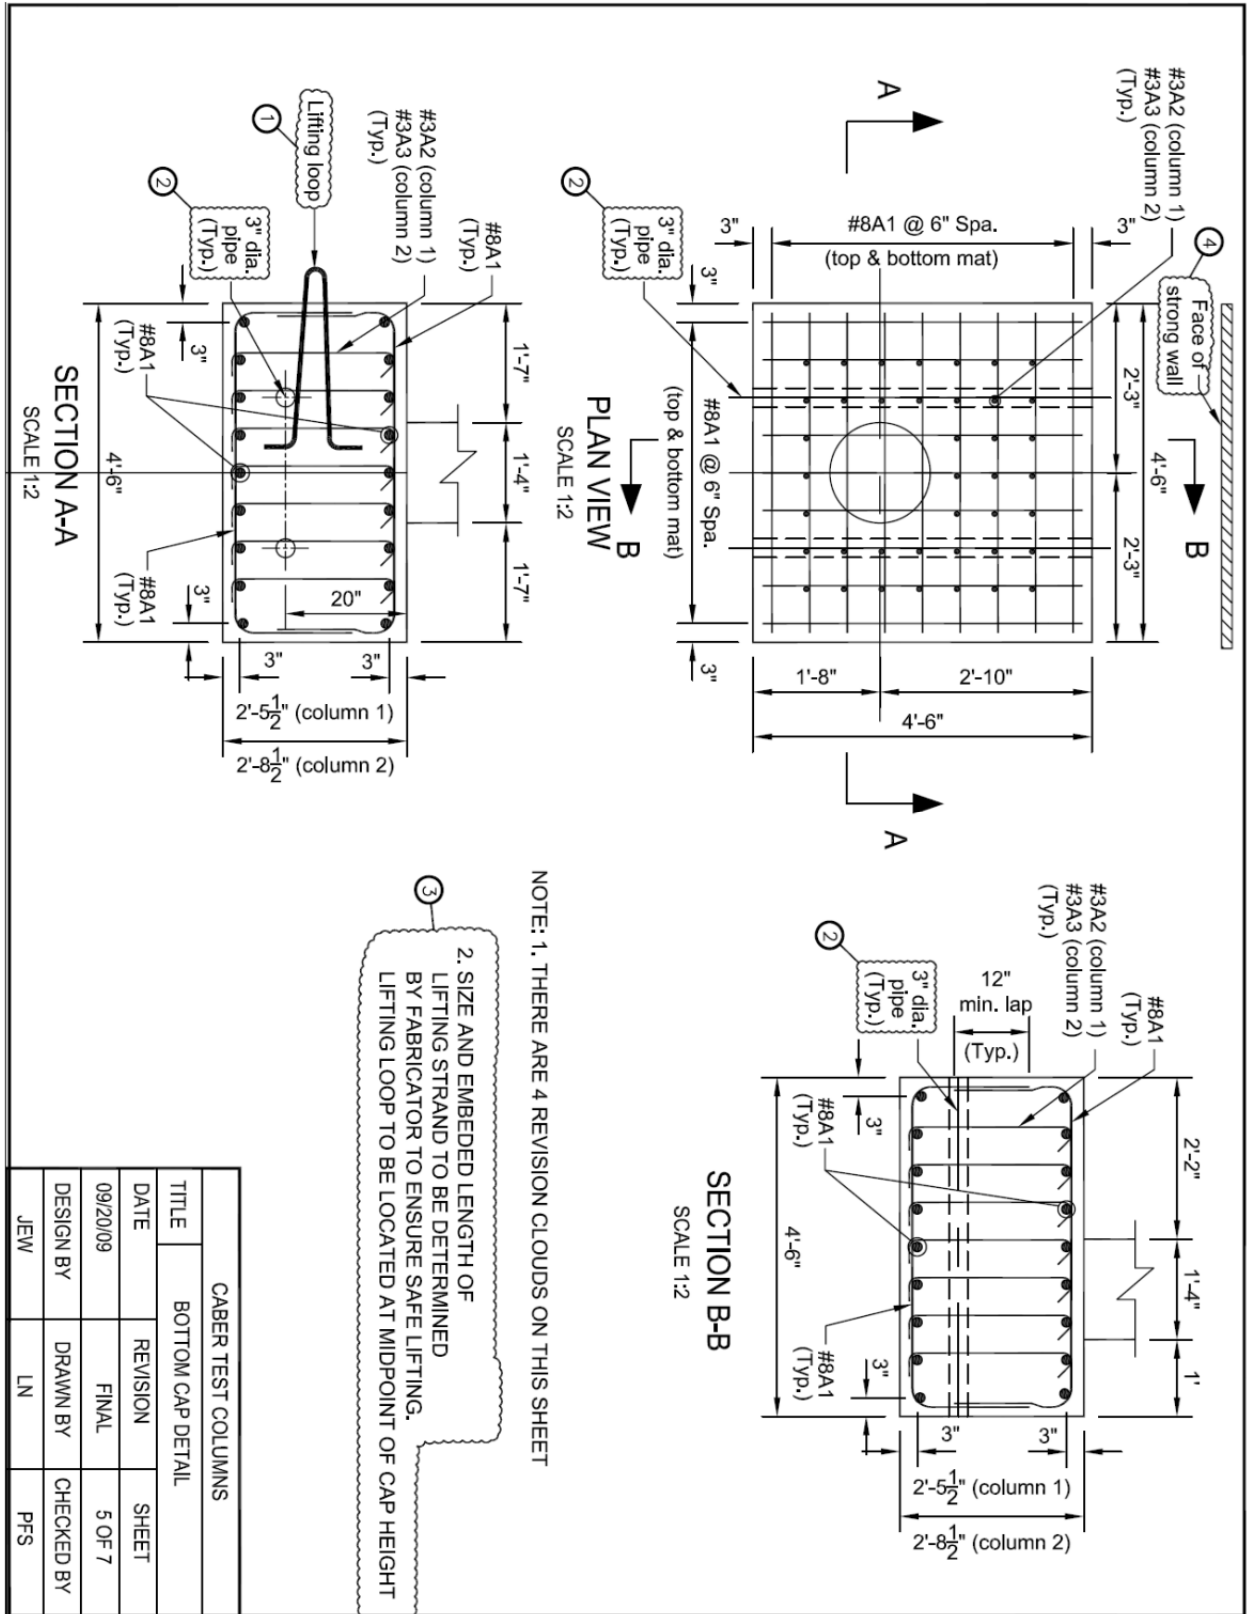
Bottom cap details of 1:3 scale bridge piers
